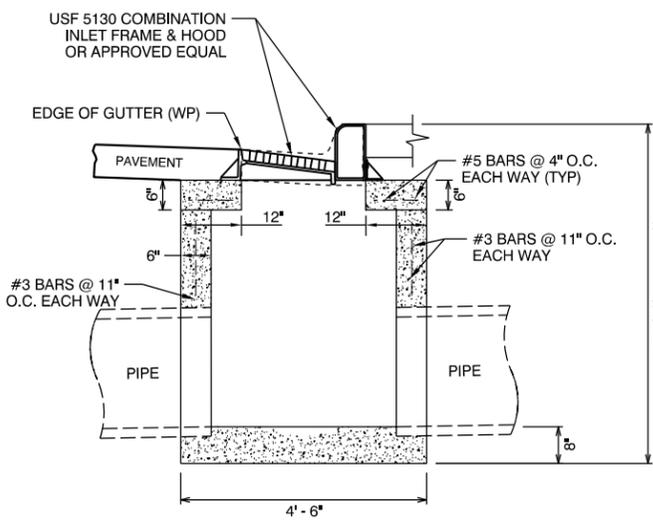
DETAIL OF GUTTER TRENCH DRAIN & GUTTER DETAIL
